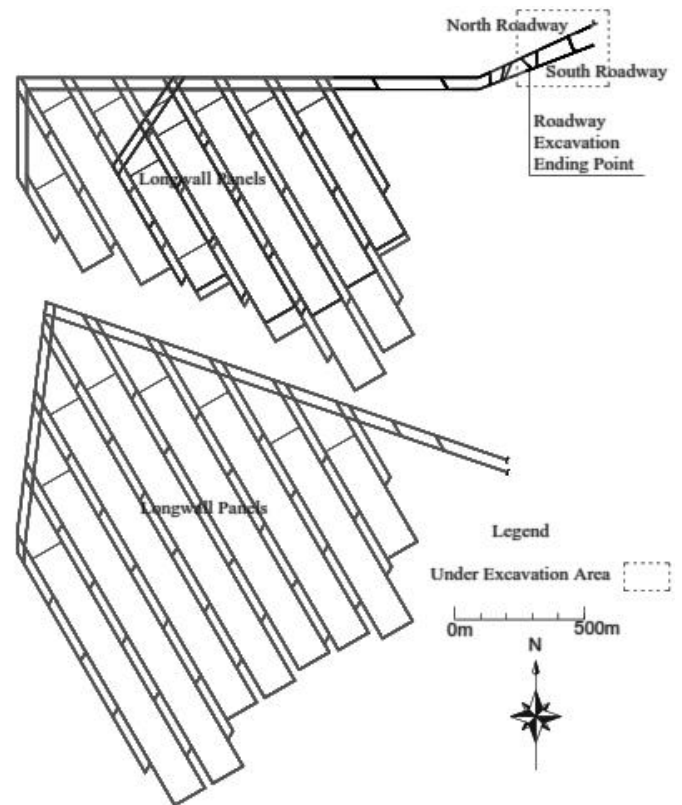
Roadway and longwall panel layouts of GDM coal mine.
